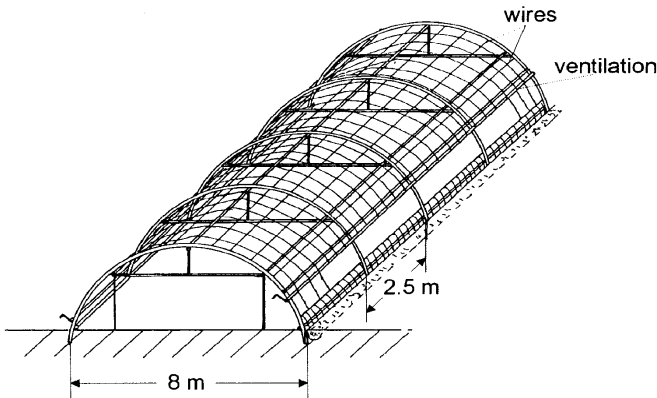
Plastic film tunnel showing cross section and roll-up side ventilation
